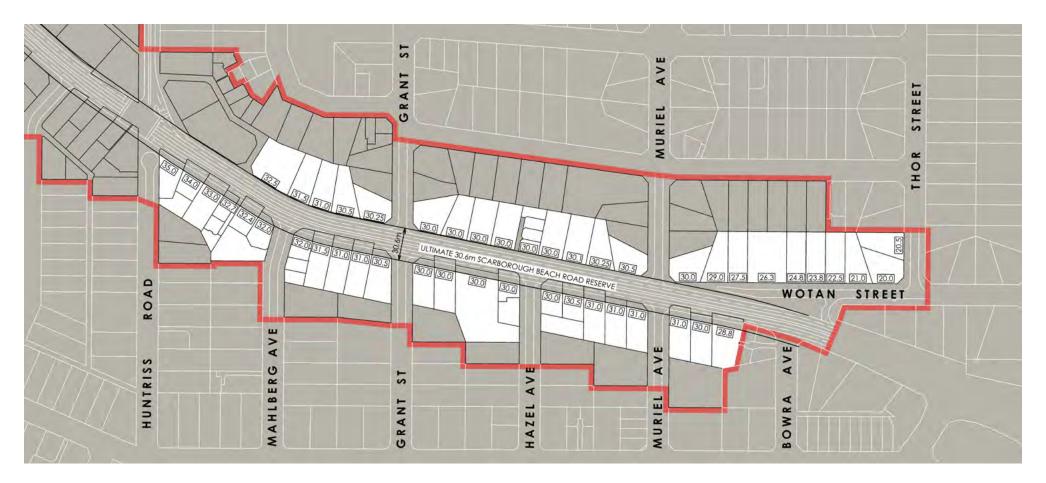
FINISHED GROUND FLOOR LEVELS ADJACENT TO SCARBOROUGH BEACH ROAD
